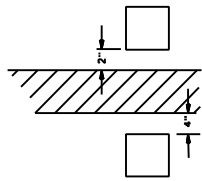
DETAIL A LATERAL PLACEMENT OF PAVEMENT MARKERS
